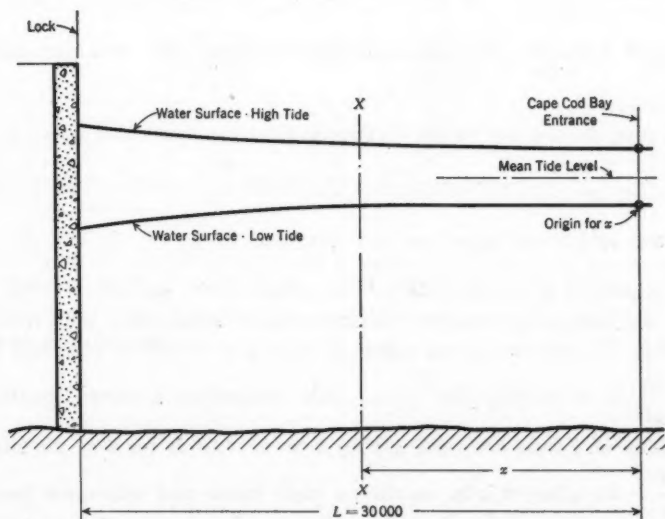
SCHEMATIC ELEVATION OF LOCKED CANAL.
